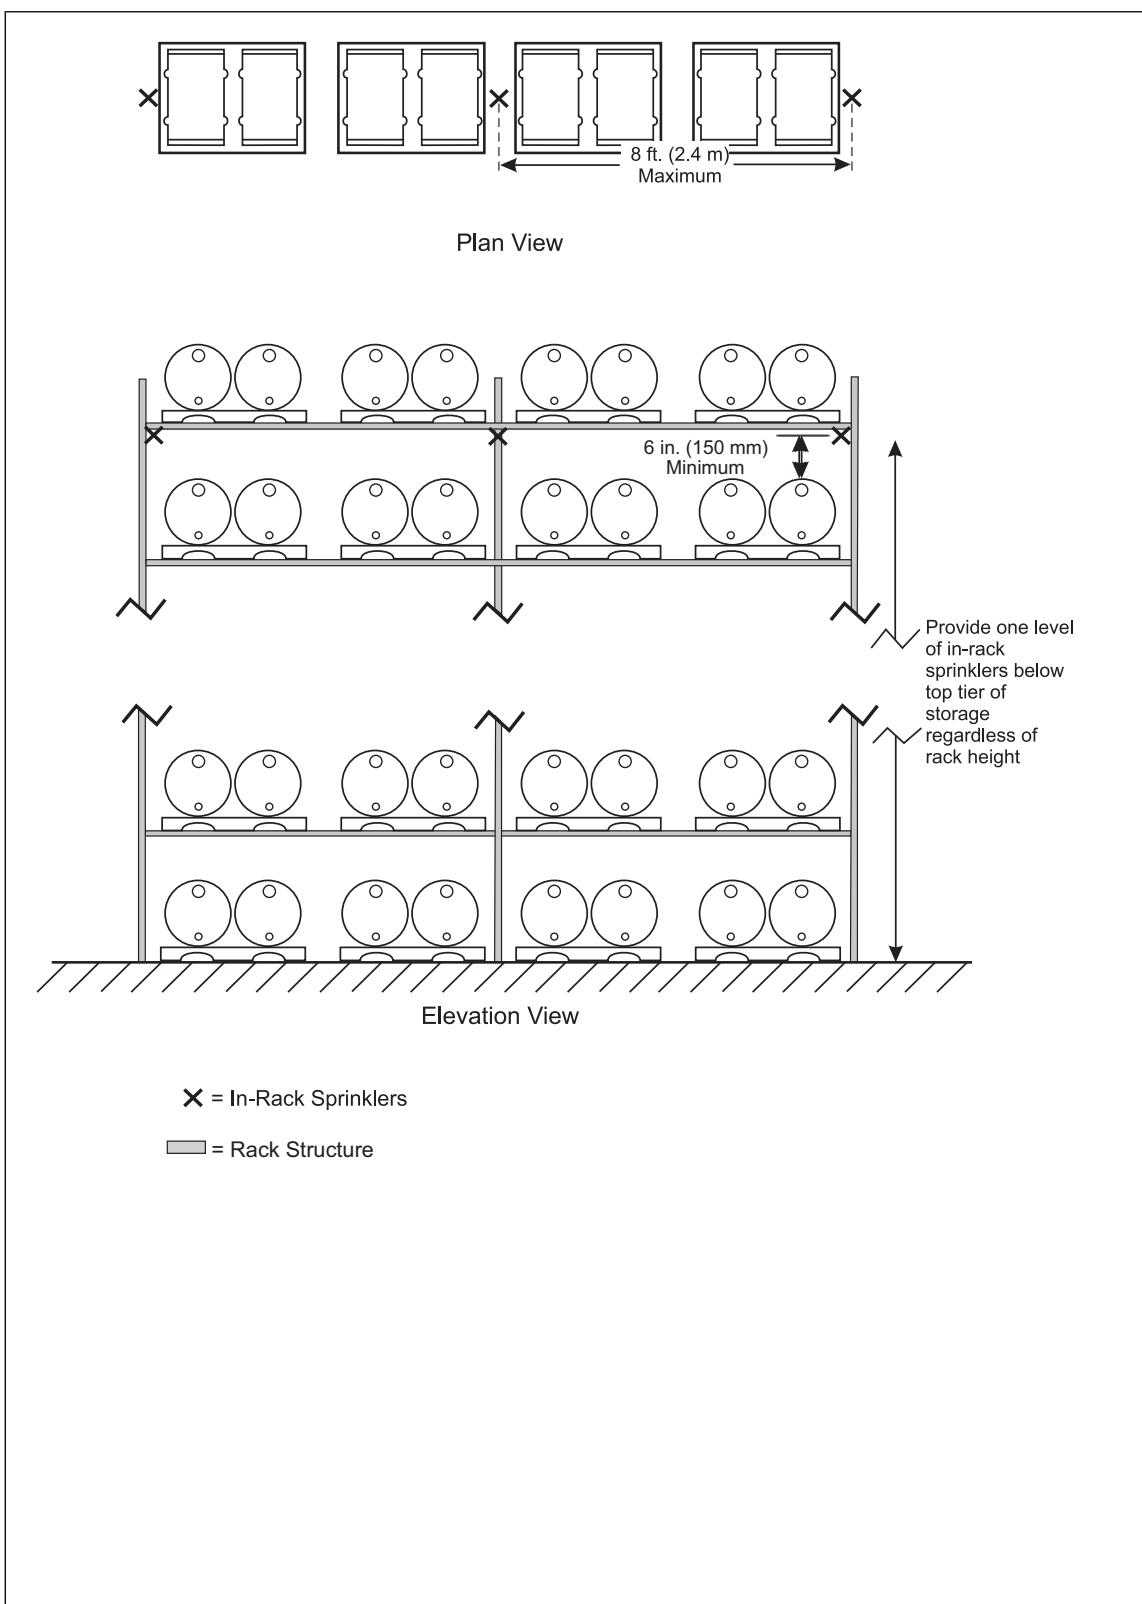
Single-row rack sprinkler layout: drum protection scheme
